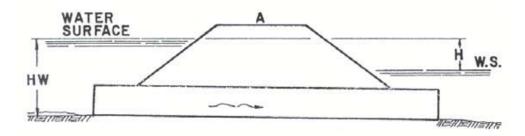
Inlet and Outlet Submerged [Source: FHWA, 2005].
